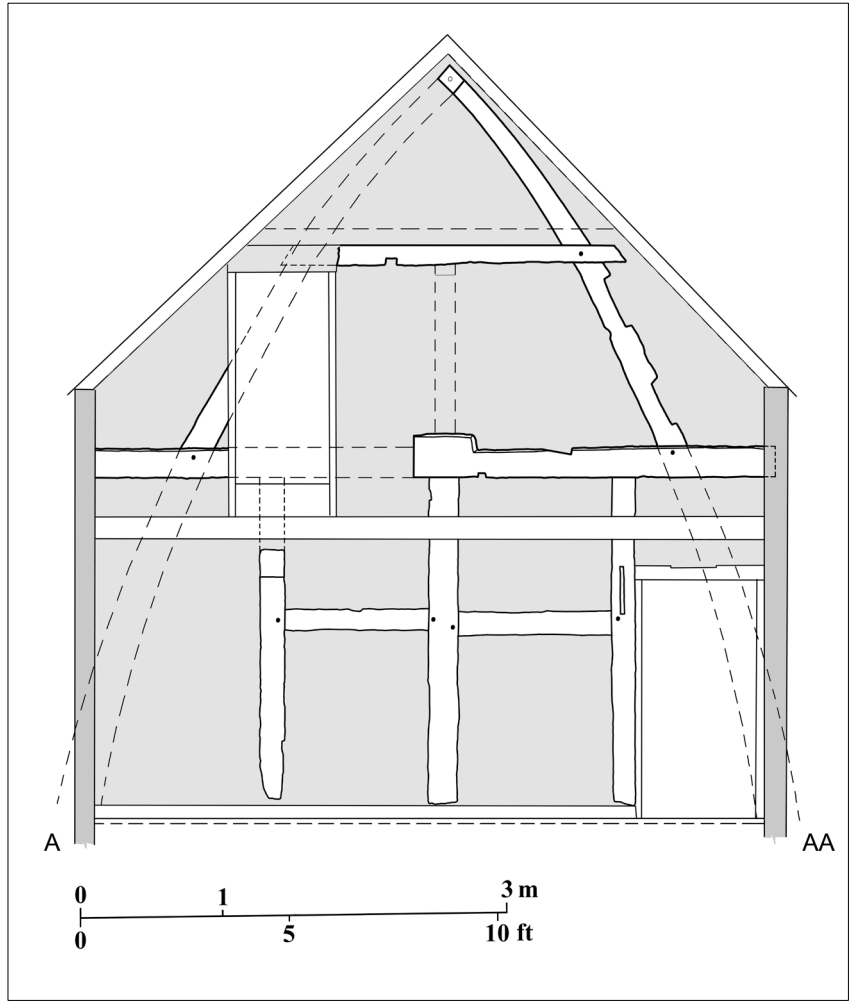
Cross-section and detail of the cruck truss at Paddock Laner Farmhouse.
